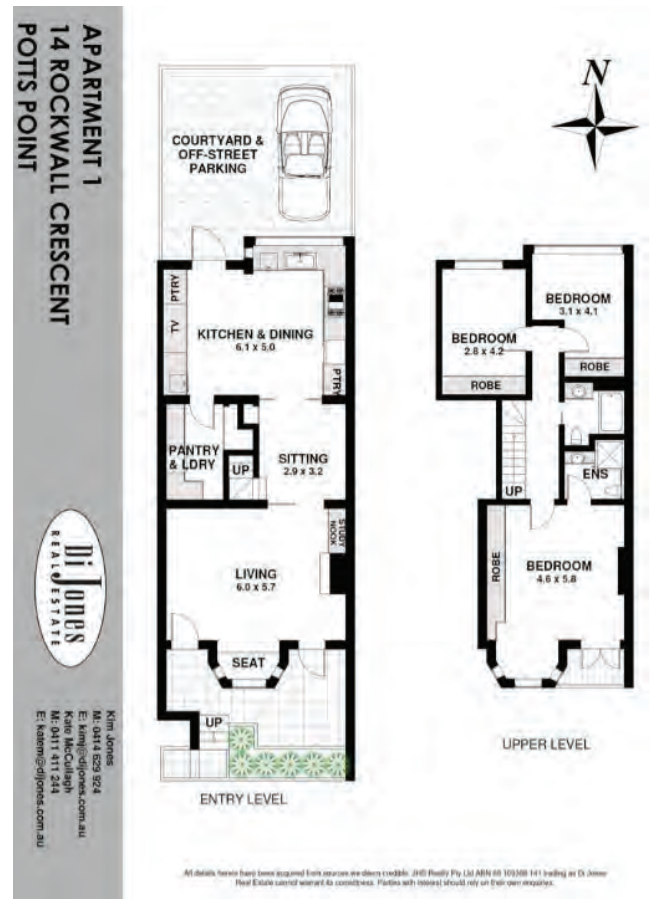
Floor plan of 1/14 Rockwall Crescent
